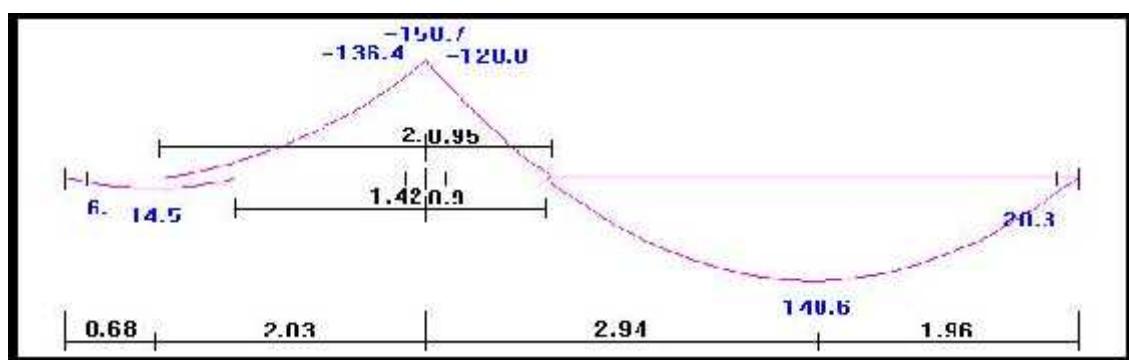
9) Moment diagram for Beam16 (KN.m)
